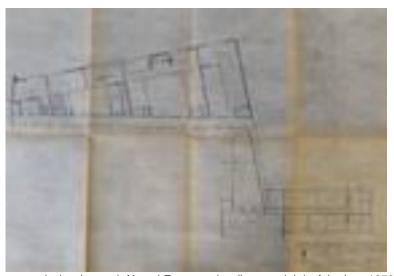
Plan of the central wing (upper left) and Eastern wing (bottom right) of the late-1950s building (North is facing upwards), By Machiels, Draye and Jacobs, 1969. Provincial Archives Limbourg, Provincial Building Department, Box 495.
